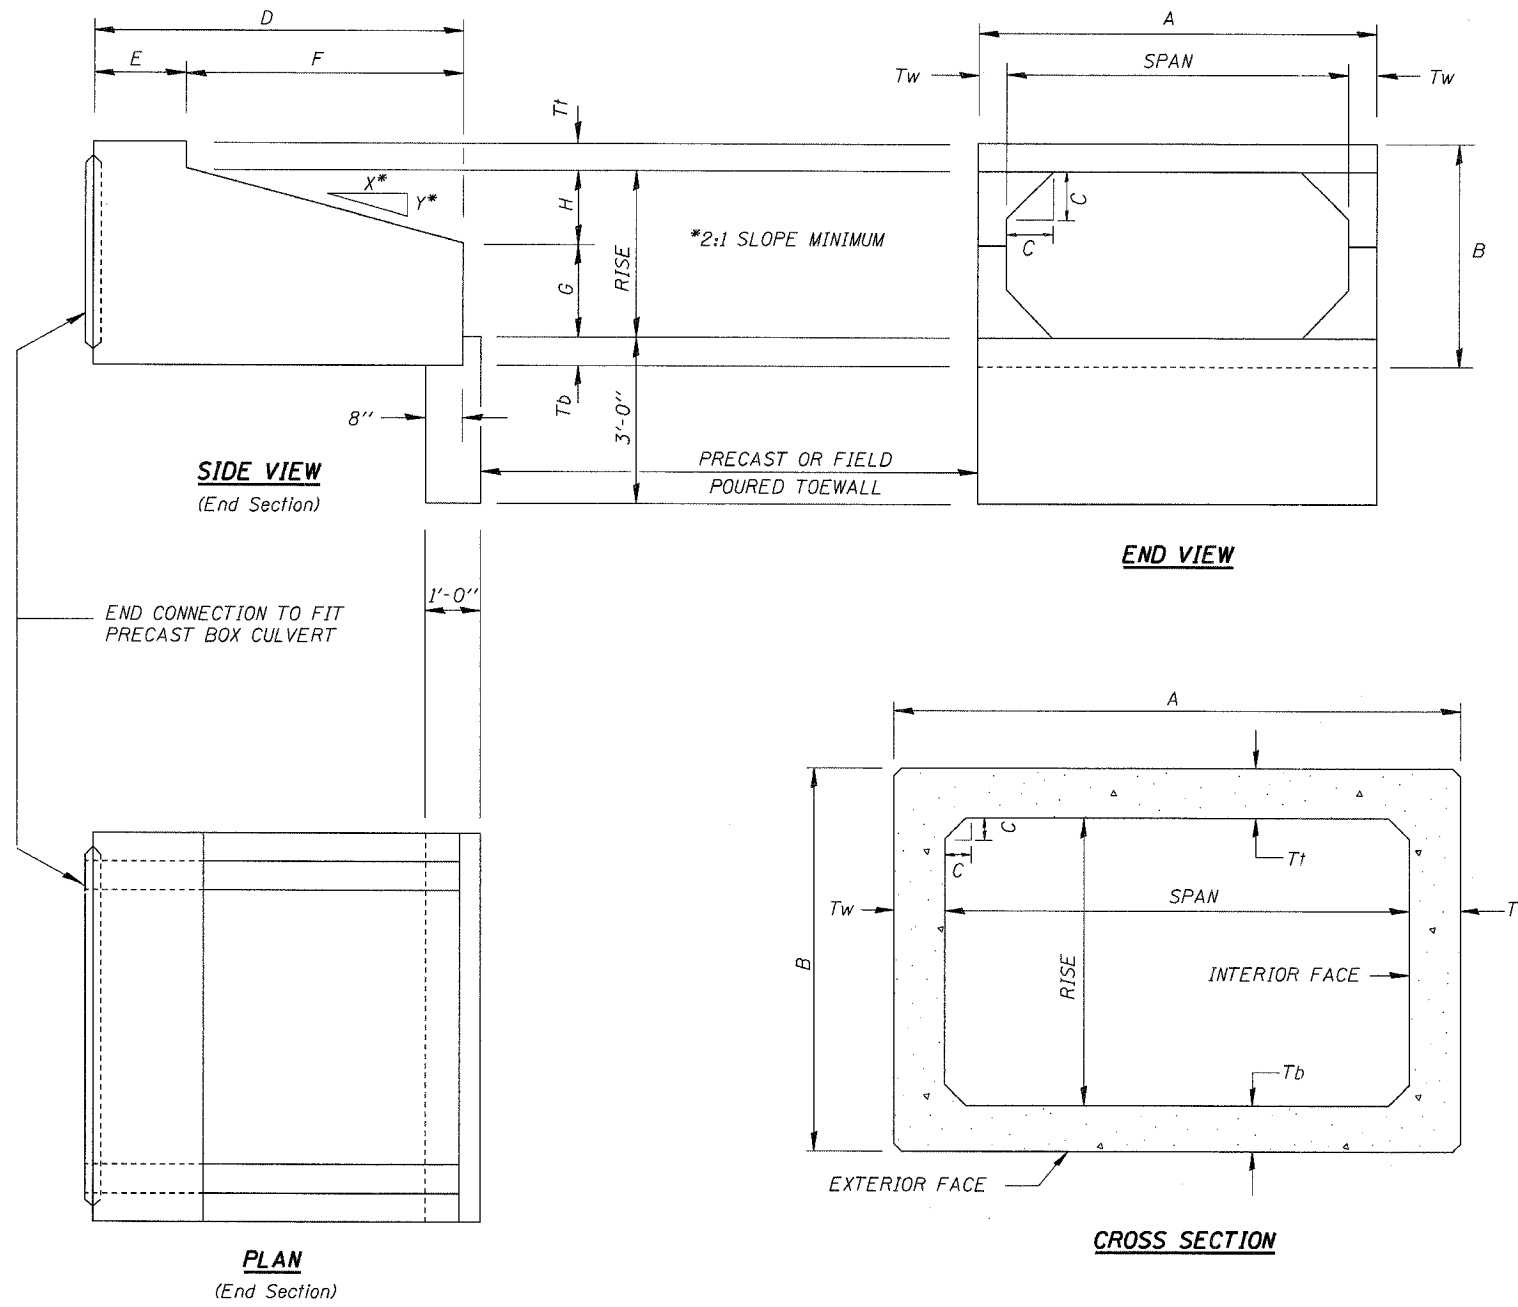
# DETAIL OF PRECAST CONCRETE BOX CULVERTS AND END SECTIONS
